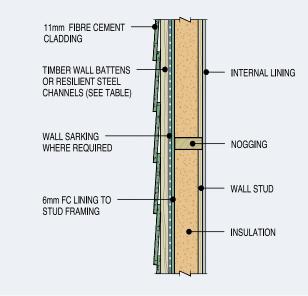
11 mm Fibre Cement over 6 mm Fibre Cement Cladding. Vertical section through wall
